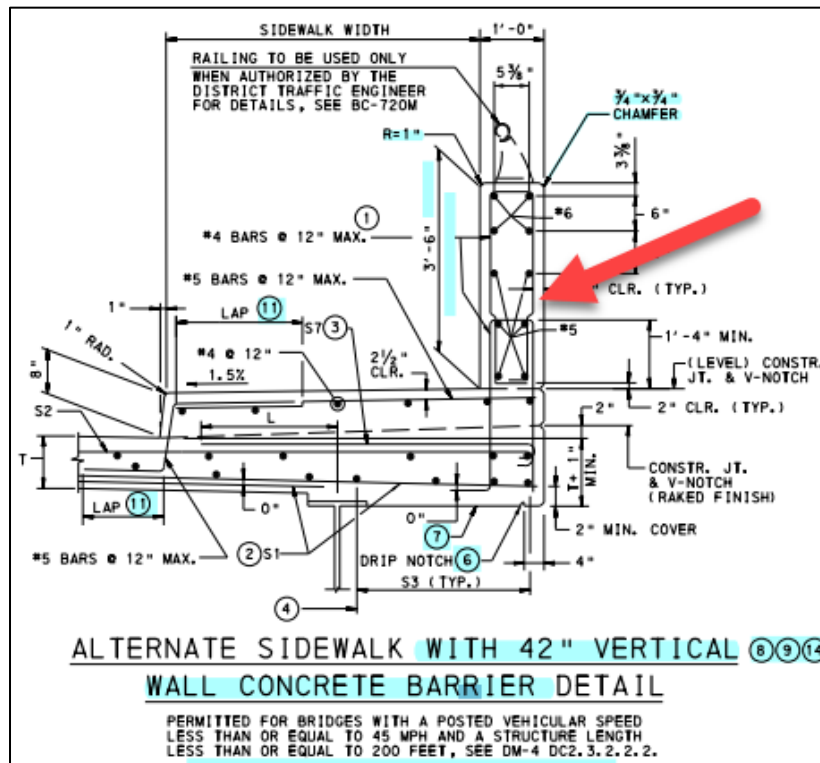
Alternate Sidewalk Detail from BD-601M Sheet 4 of 12 with Barrier Cast on Sidewalk
